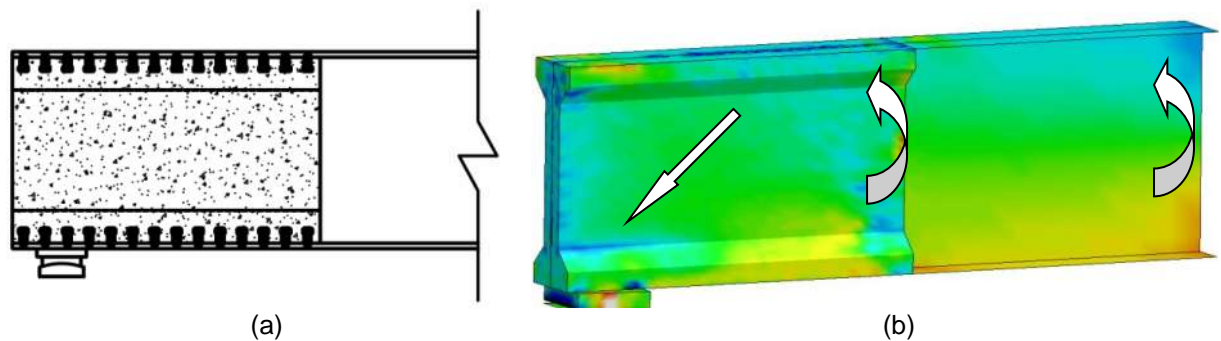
Undamaged and Damaged Limit States for the FE Girders
